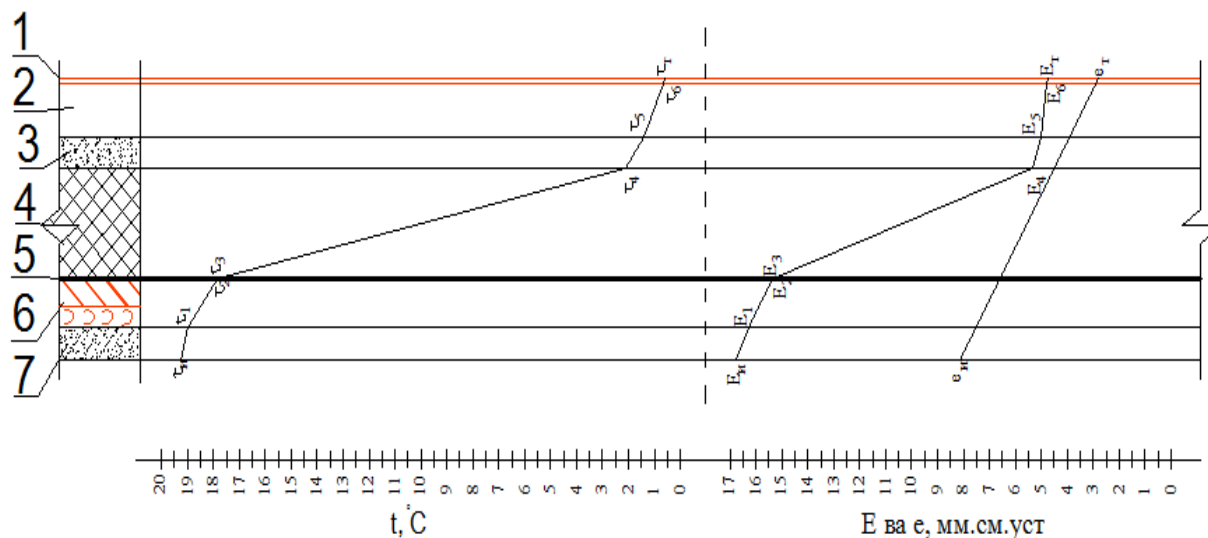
Heat protection Moisture condition of the roof structure made of polyurethane foam. Plaster 1; 2 wooden sheets; 3-vapor barrier; 4-polyurethane foam; Plaster of 5 somonis; 6th air layer; 7-asbestos-cement sheet.
